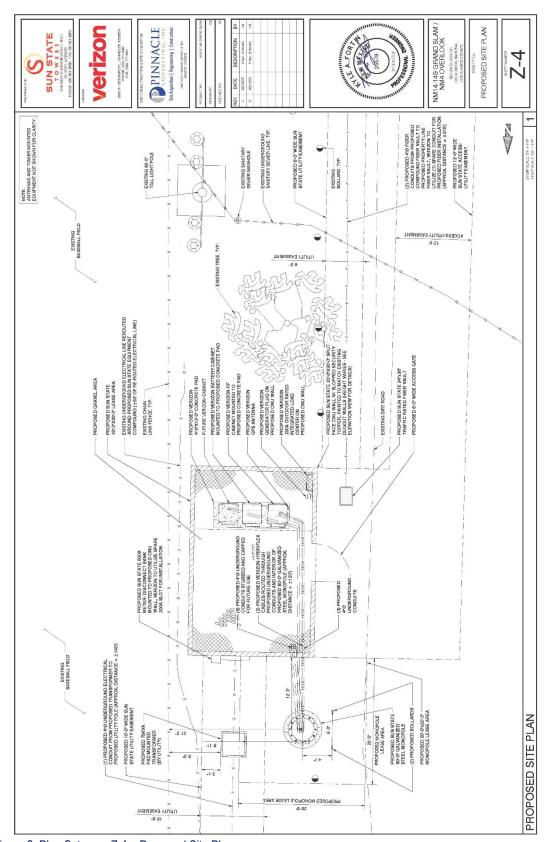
Plan Set page Z-4 – Proposed Site Plan.
